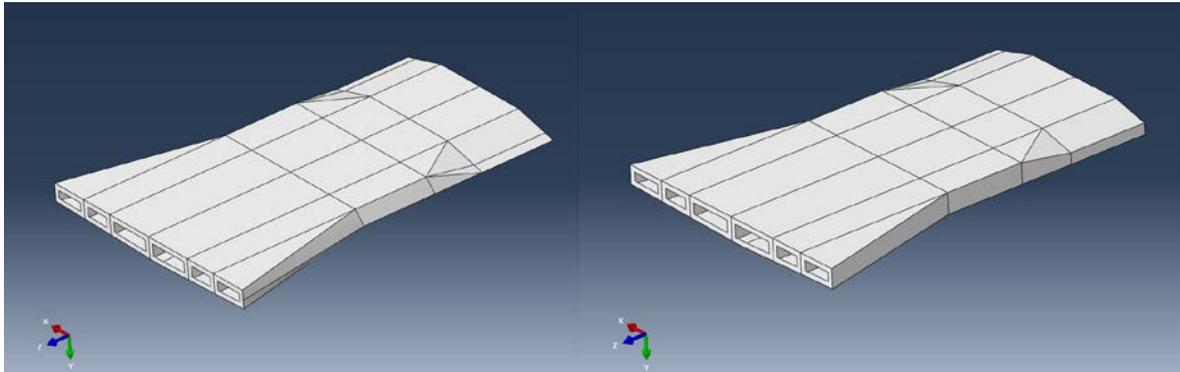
Transition from trapezoidal bridge girder section to rectangular section to 40 m width, viewed from below, with and without airfoils included respectively
